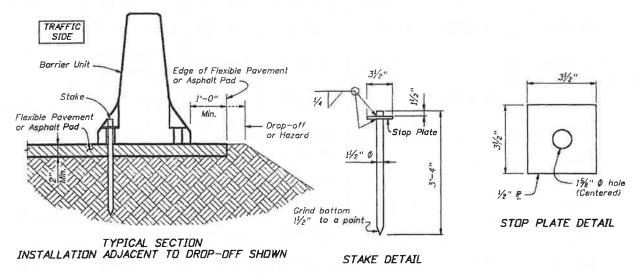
Anchoring barrier with vertical pins Source: FL DOT 414 Sheet 6
